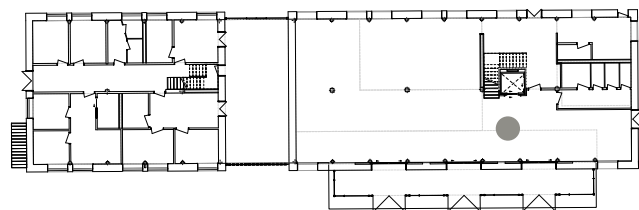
Floor plan: Accommodation Building II & Dinning hall (Ground Floor)
